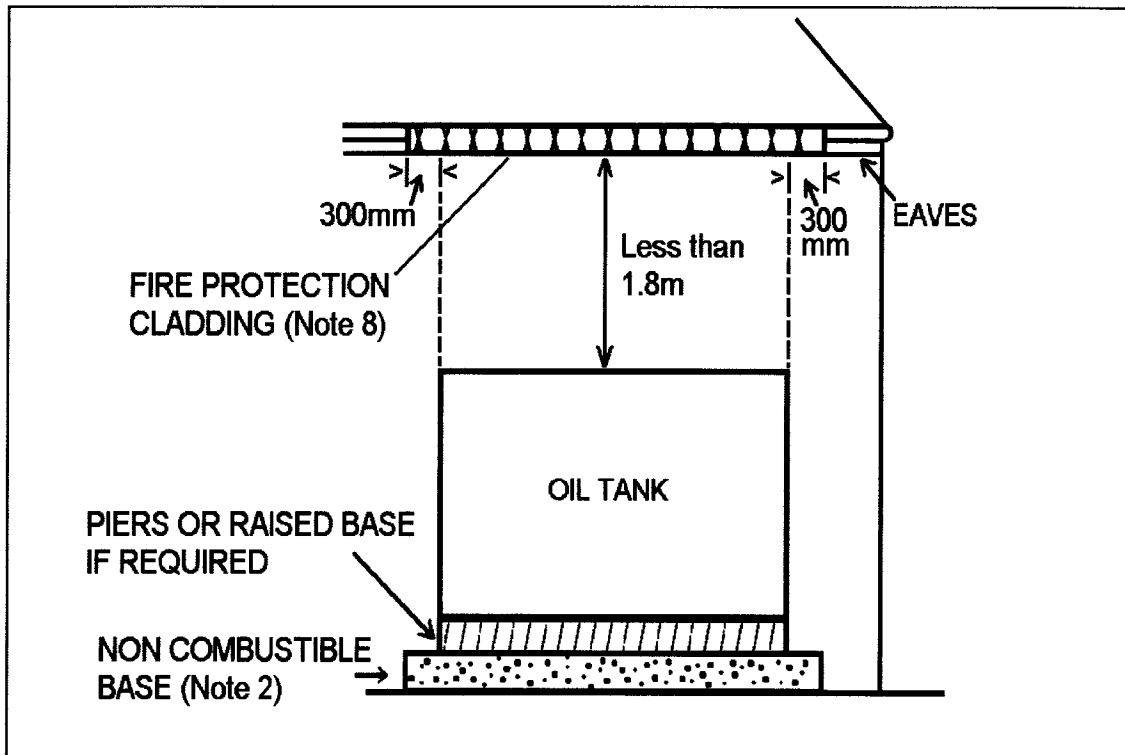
Class 1 tank installation near non combustible buildings and boundaries
